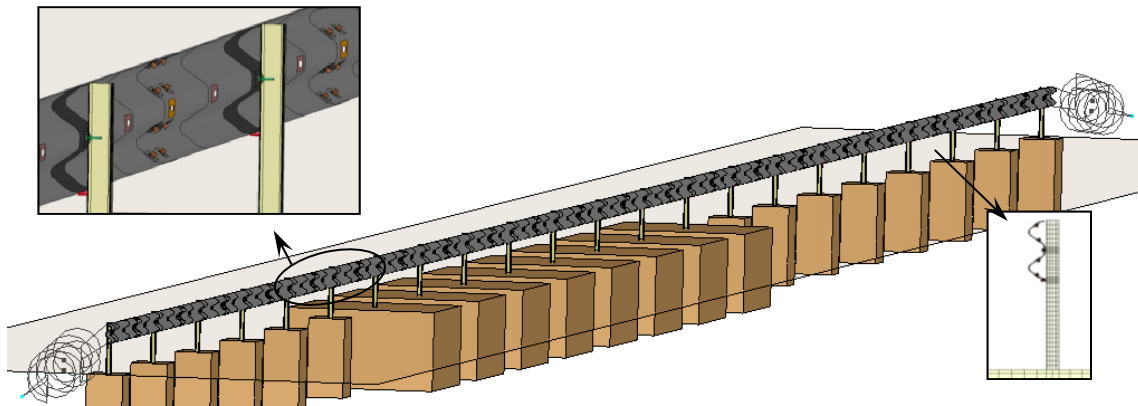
Finite Element Model developed for the modified weak-post W-beam system.
